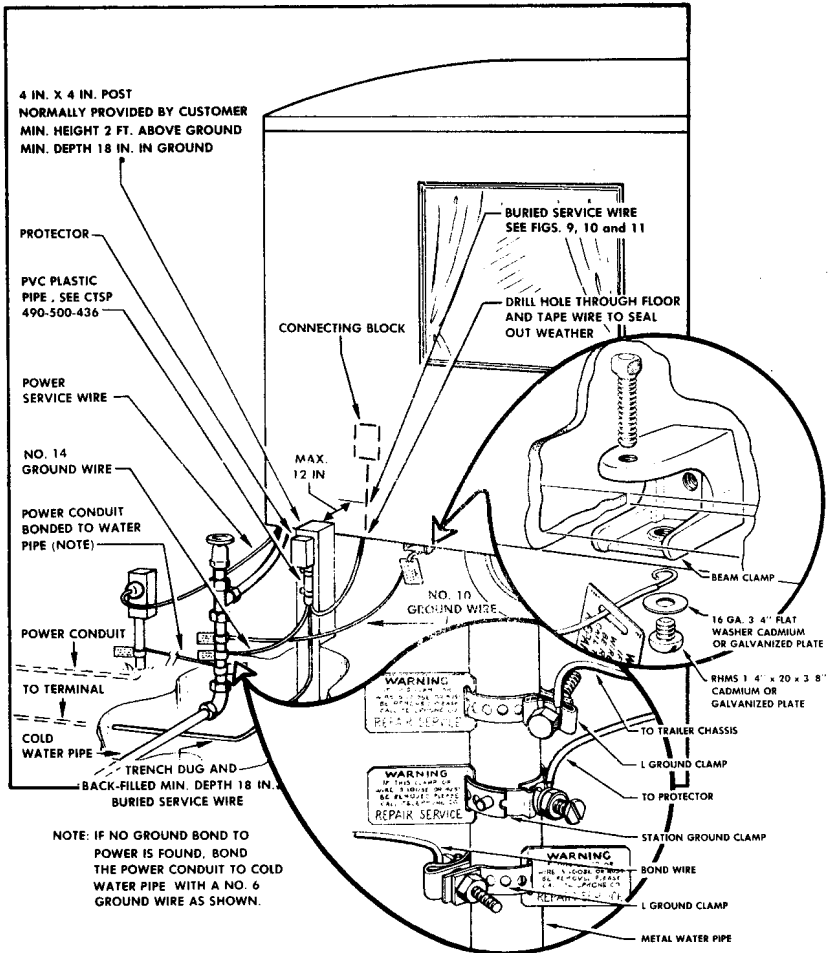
Typical Installation - Buried Distribution Water Pipe Ground
